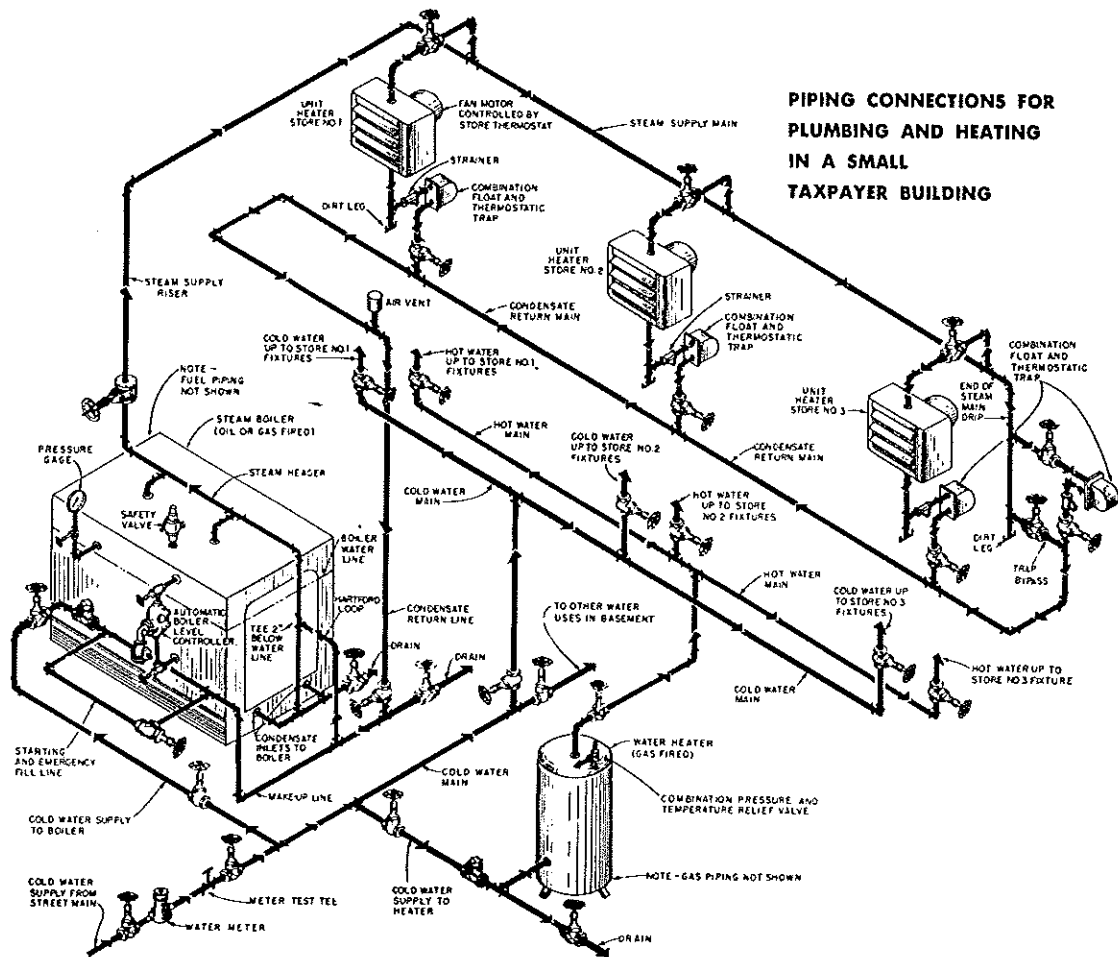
Typical piping layout for plumbing and heating. Courtesy Jenkins Bros., manufacturers of valves.
